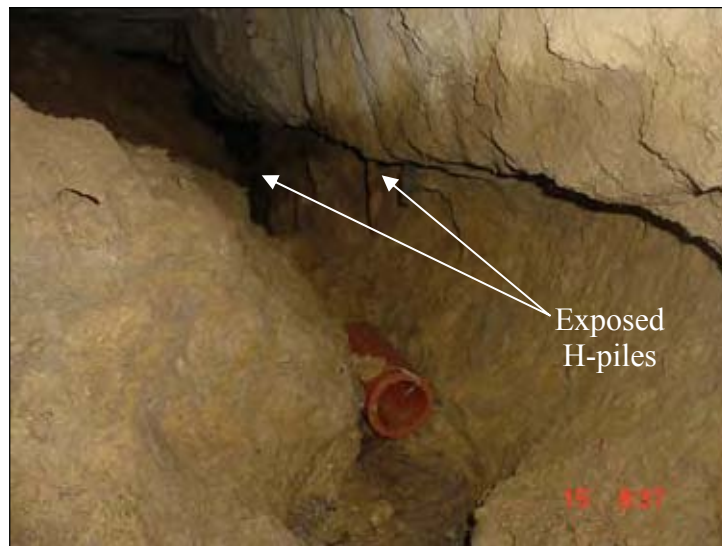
Void created under bridge approach exposing H-piles (Side view)
